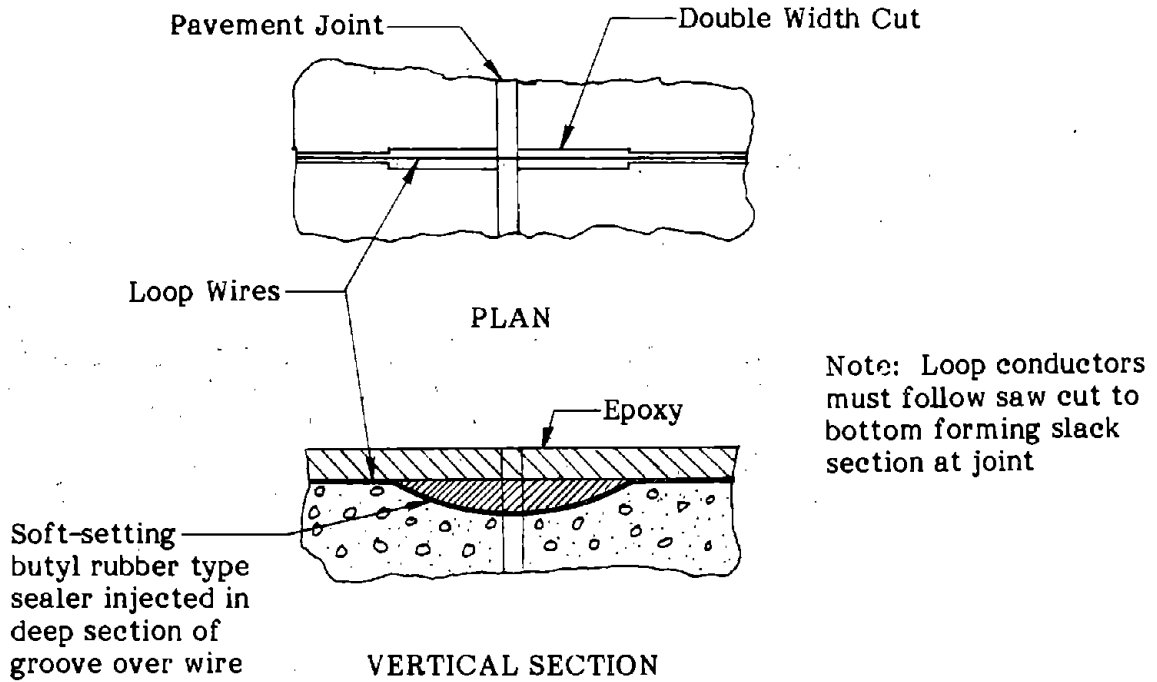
Pavement joint details for loop detectors used by the State of Iowa Traffic Engineering Department
